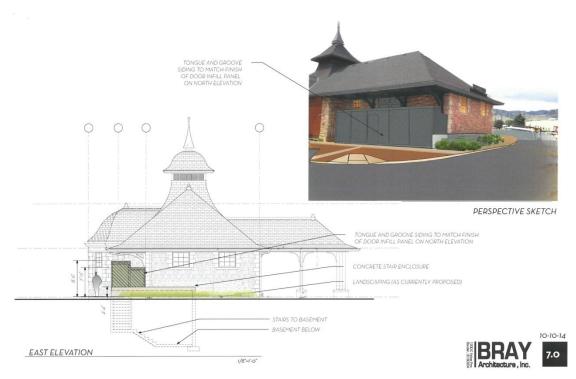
Proposed East Elevation and Perspective Sketch, 2014.
